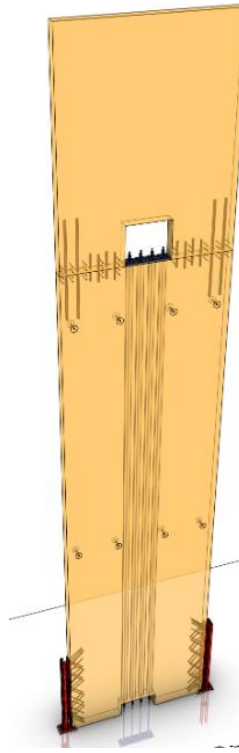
CLT rocking shear wall diagram (Source: StructureCraft, OSU Peavy Building)
